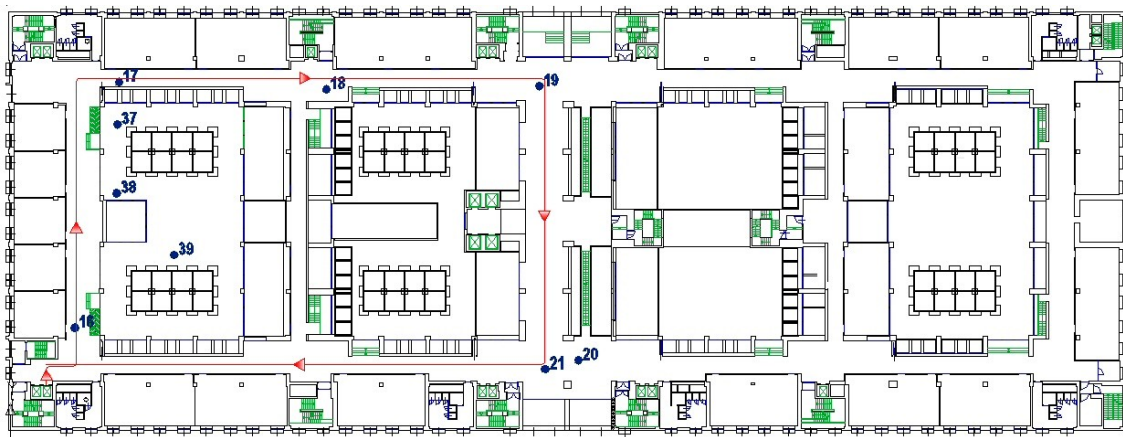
Biccoca building B, enlarged view of floor $(j-1)^{th}$.
